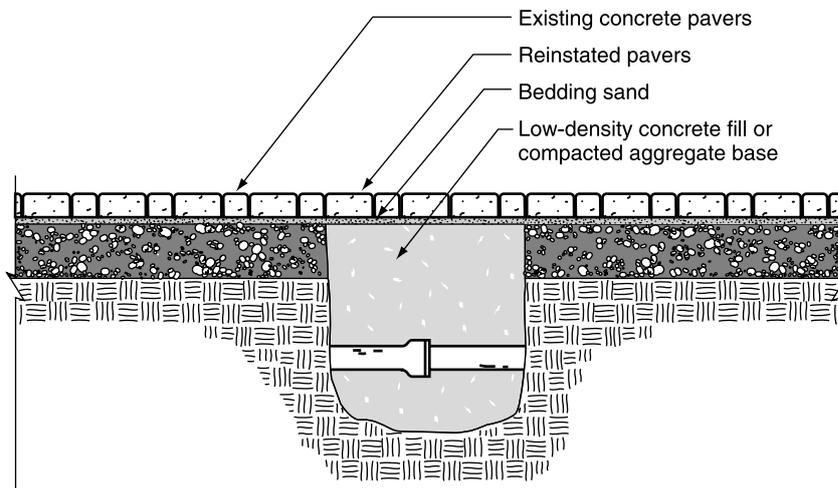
Cross section of reinstated utility cut into interlocking concrete pavement.
